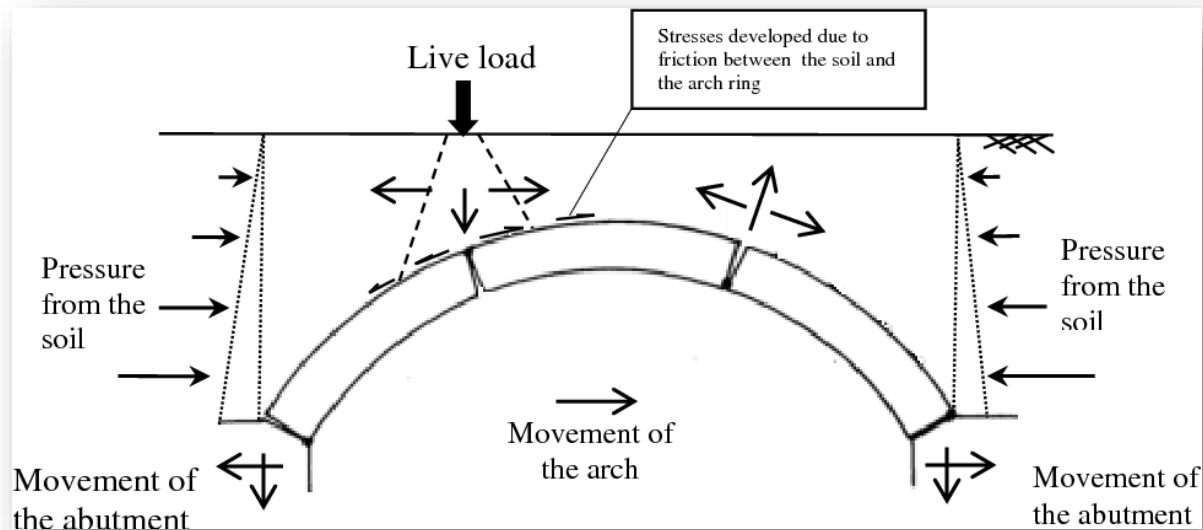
Typical four-hinged rotational failure of a masonry-arch bridge
